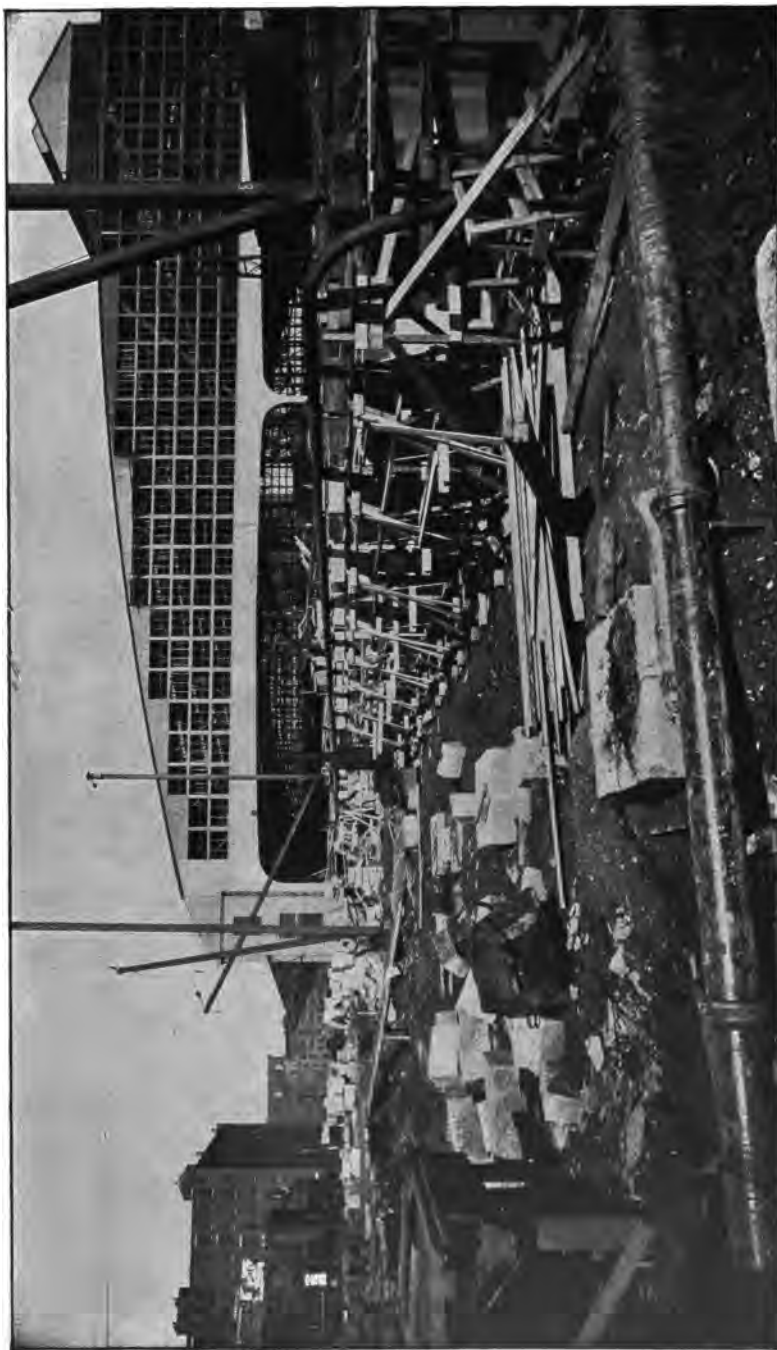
PORTION OF 8-INCH HOT-WATER RETURN MAIN TEMPORARILY SUPPORTED IN PERMANENT POSITION IN WHAT WAS AFTERWARD BASEMENT OF EXPRESS BUILDING. PIPE ENTERS WESTERLY END OF TRANSVERSE SUBWAY, WHERE IT TURNS DOWN AND TO THE RIGHT. THE BUILDING WAS HEATED THROUGHOUT THE WINTER OF 1898-99 WITH RETURN MAIN IN THIS CONDITION.
